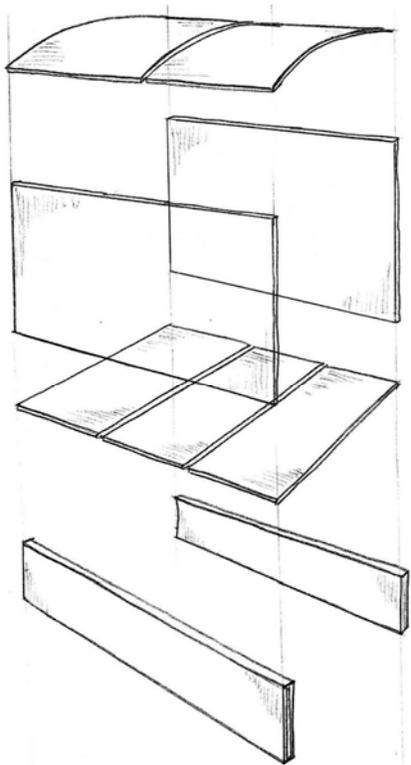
Exploded View of the First Arnhem Zoo Glass Bridge (Nijssse 30)
